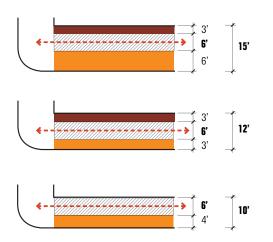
Effective Sidewalk Width – 6' Minimum Throughway Zone
